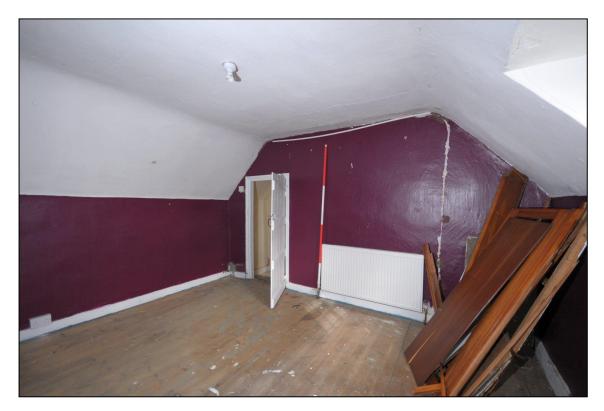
No. 43, bedroom 1, looking north-west (Scale 2m)
